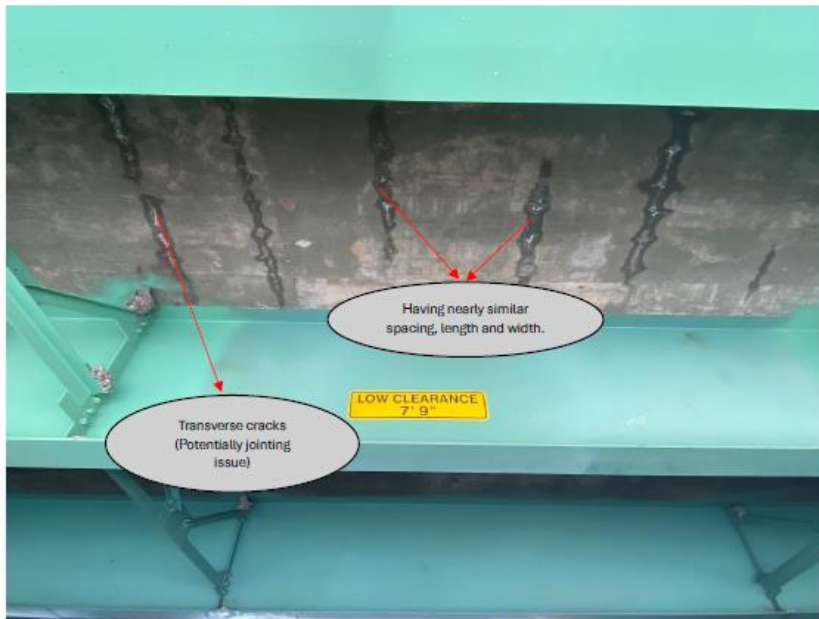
Transverse Crack Seeping Water (Drying Shrinkage with potential jointing issue)
